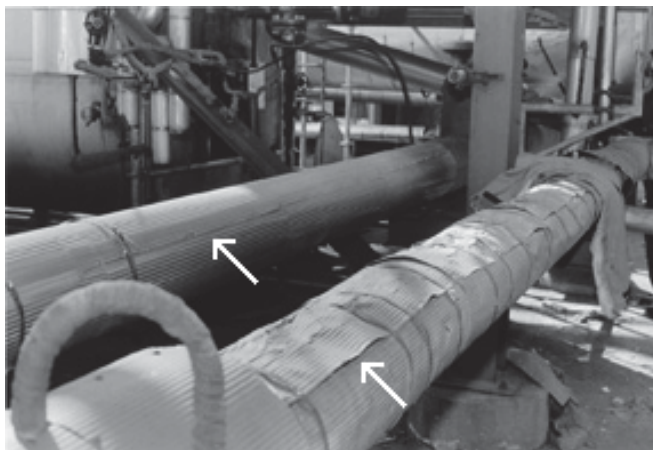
Photo Showing Piping with and without Damage to the Insulation System
